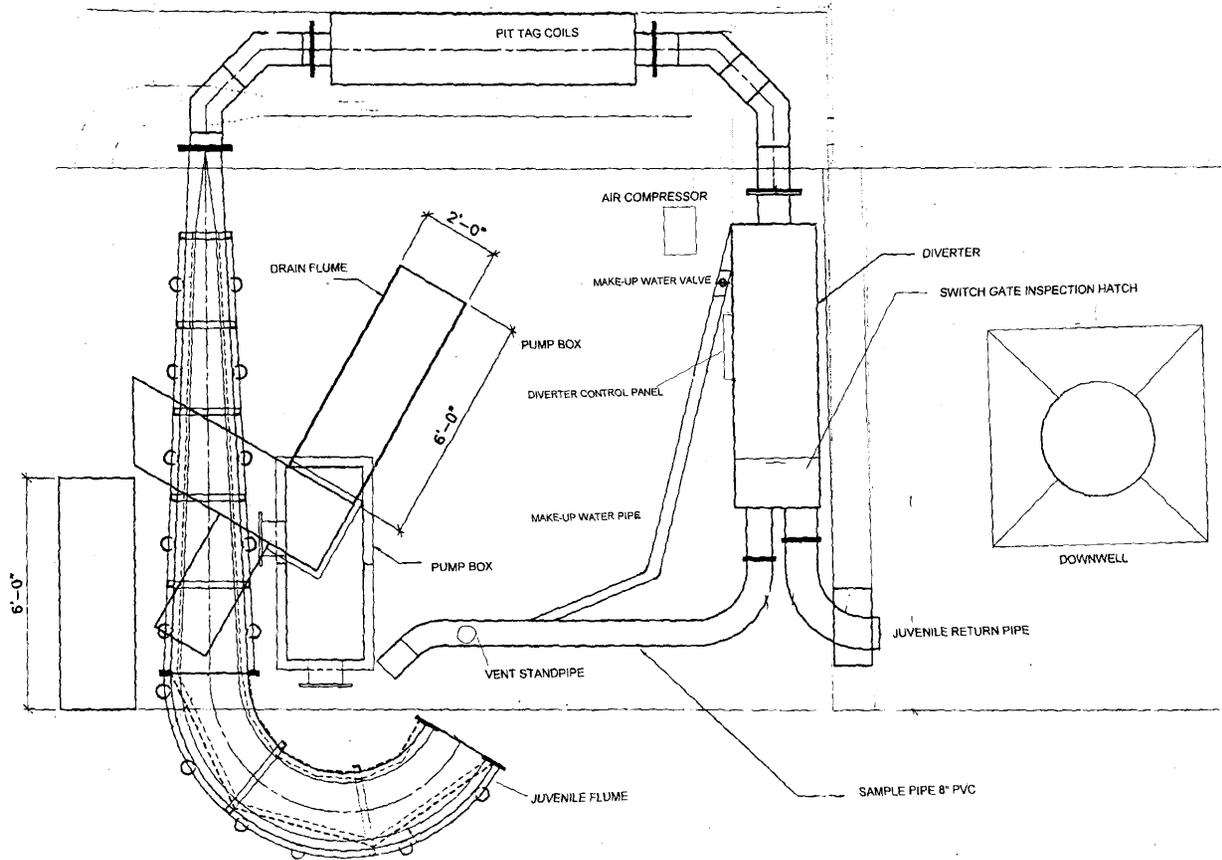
PH2 PIT tag and collection system, lower level, 1997-1998. This system was dismantled in 1999 to allow construction of new bypass at PH2.
